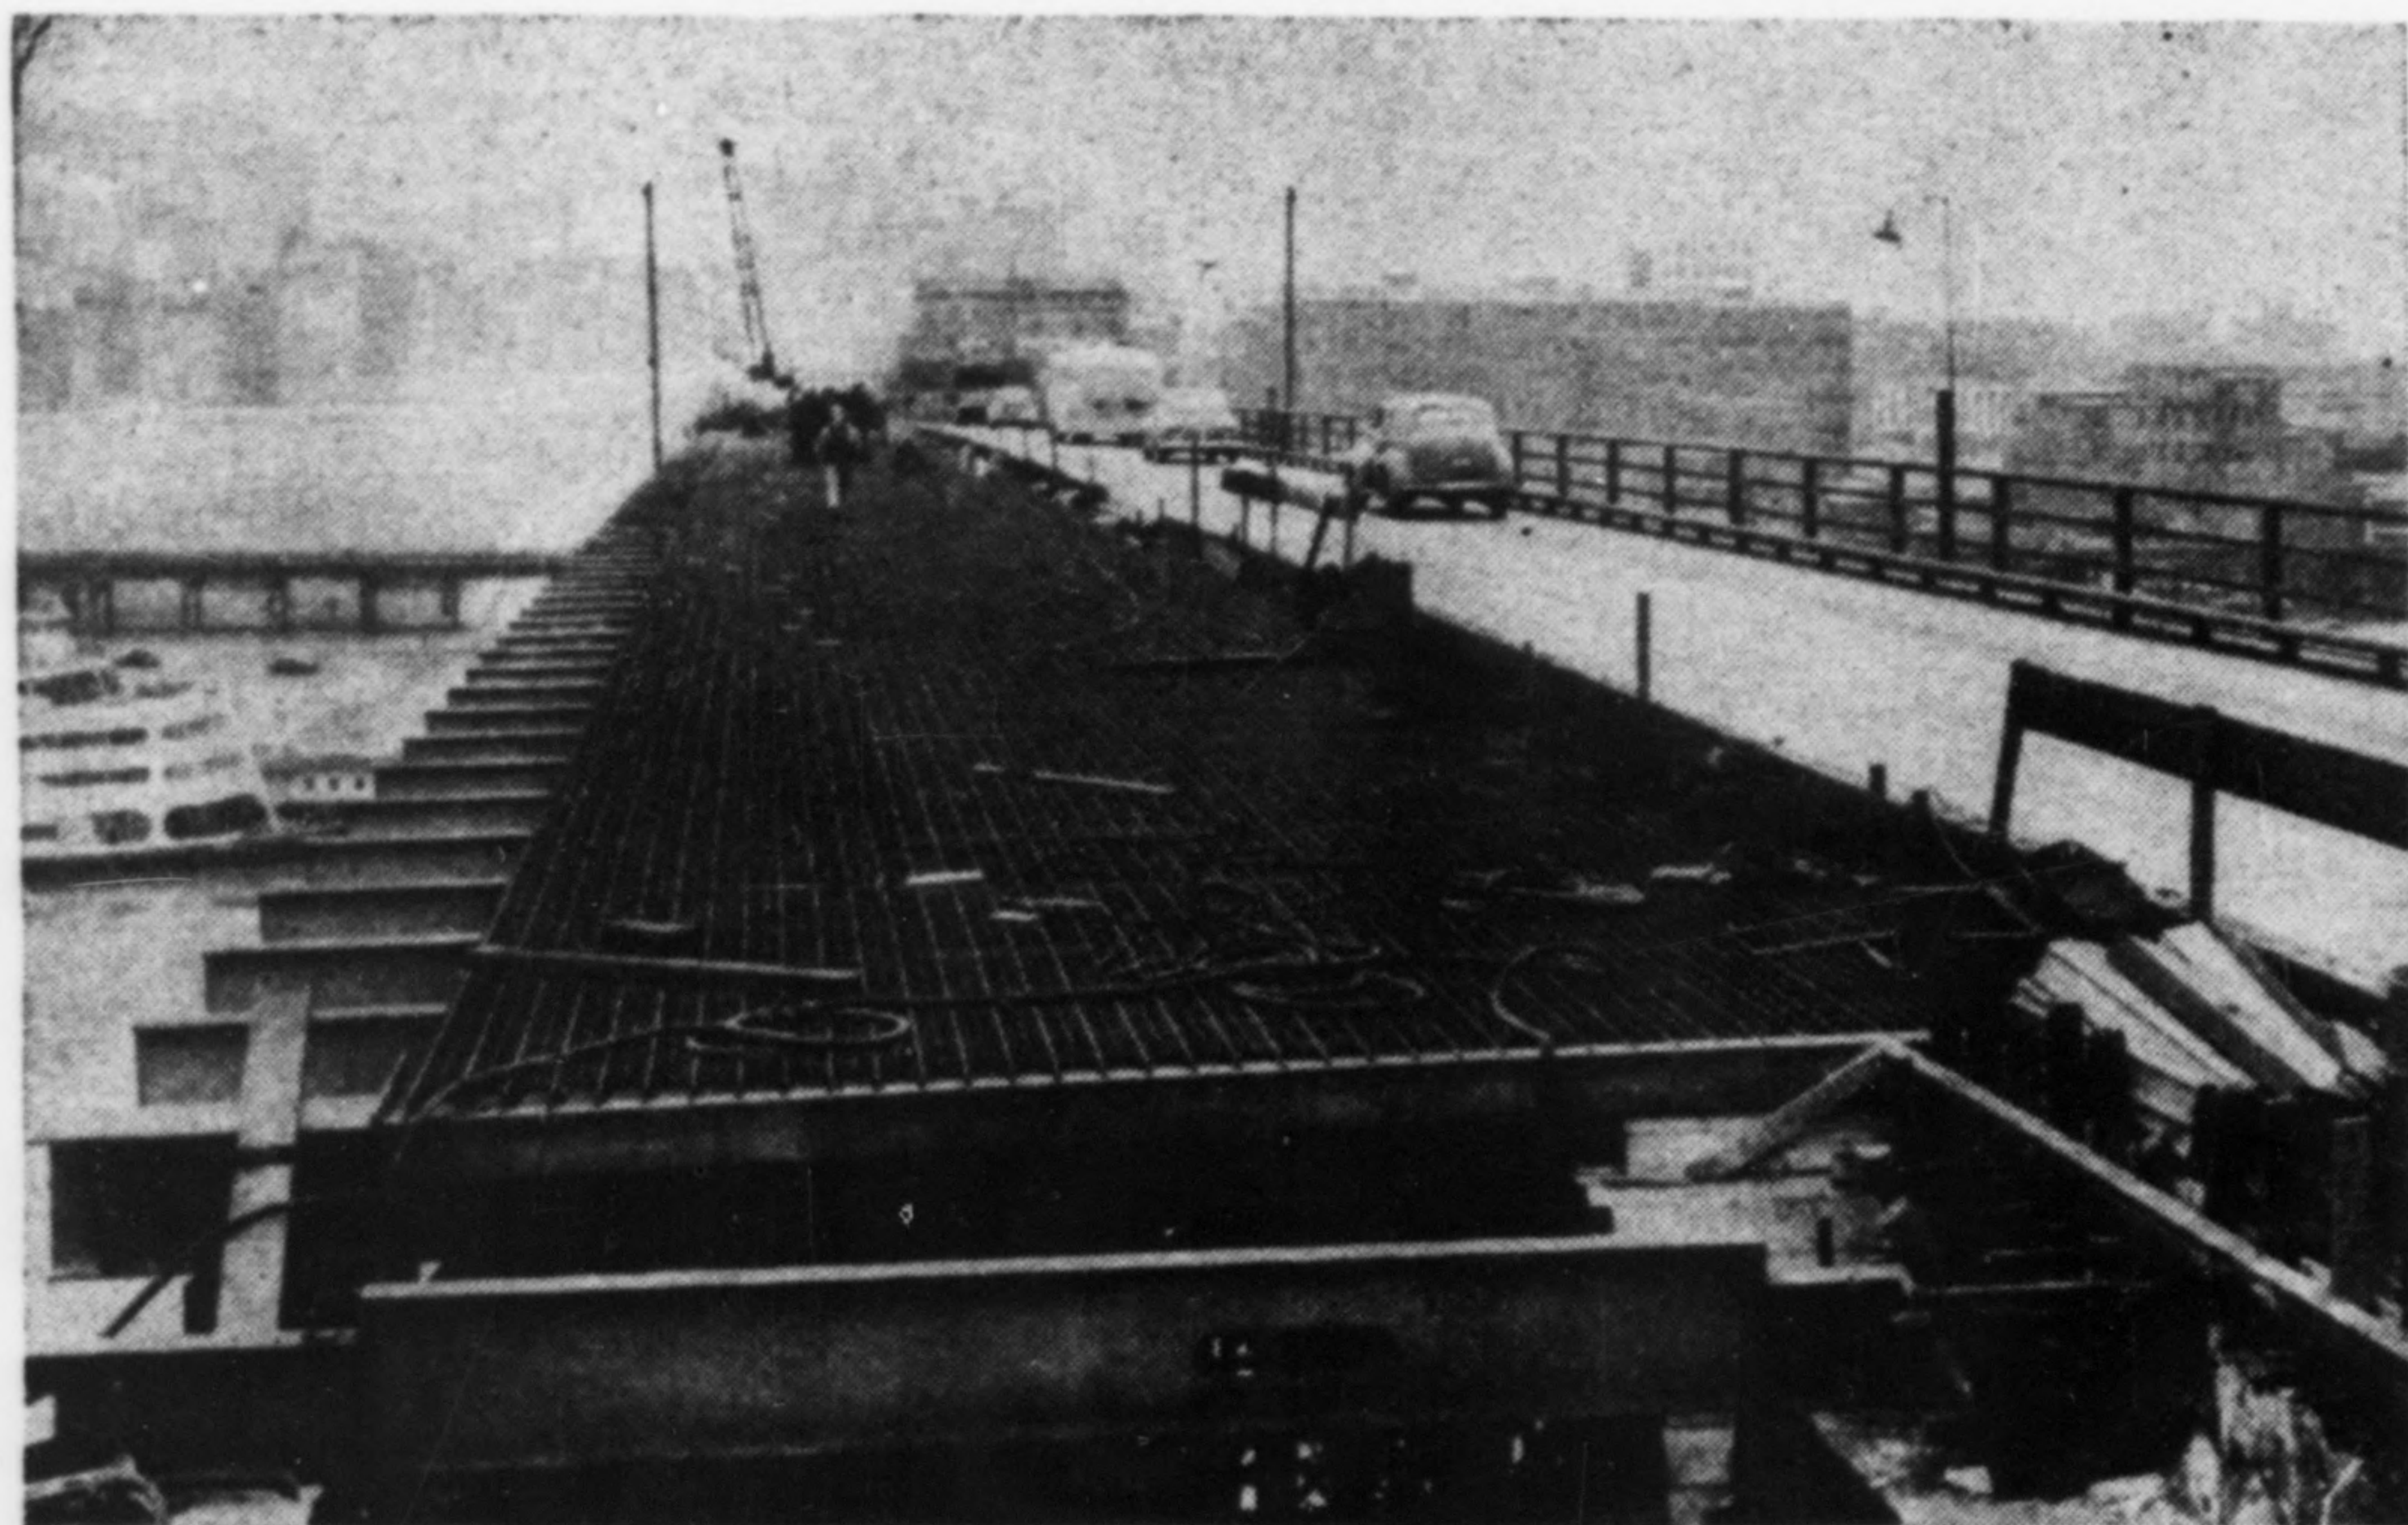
Expansion devices transmit the wind load stresses to the masonry piers from the all-welded floor system and deck.
